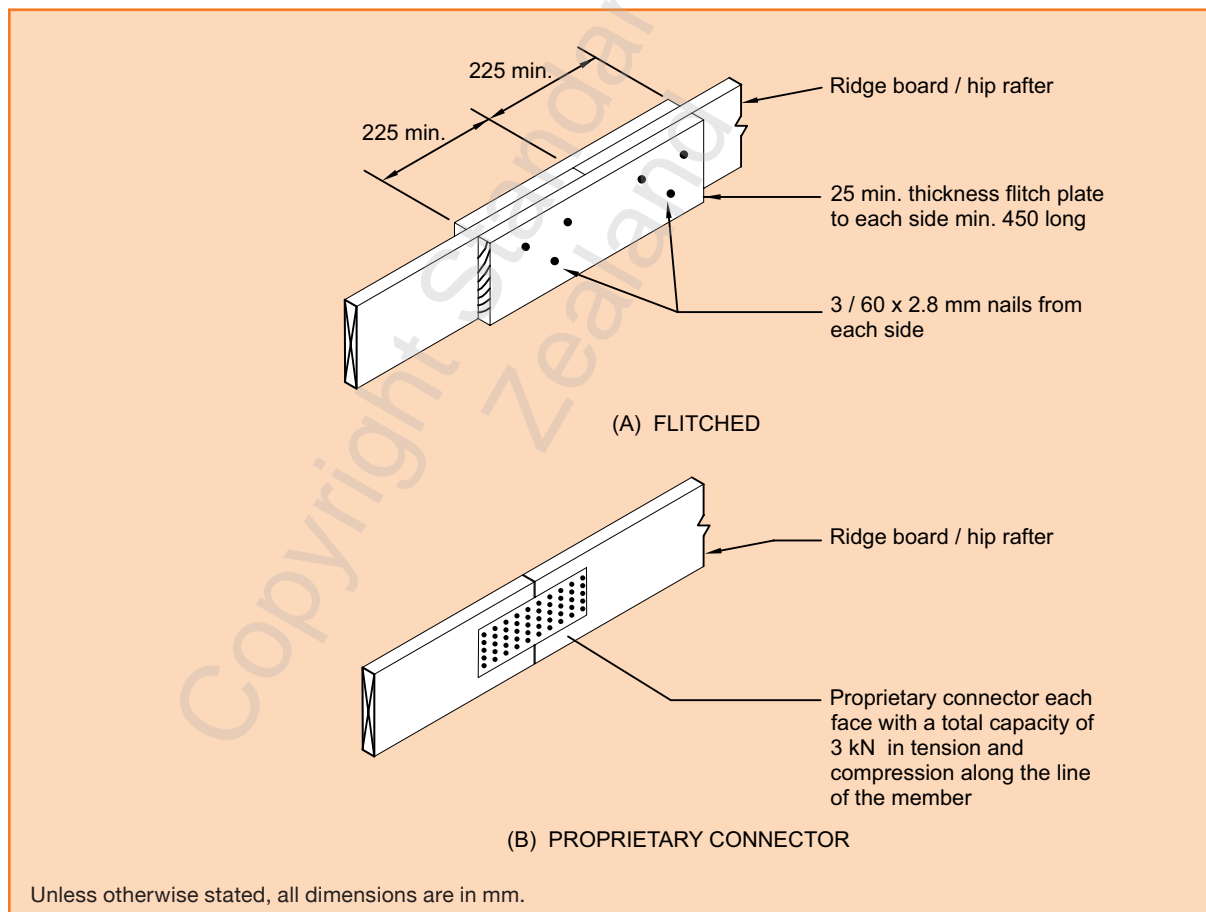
Jointing hip rafters and ridge boards (see 10.2.1.2.3)
